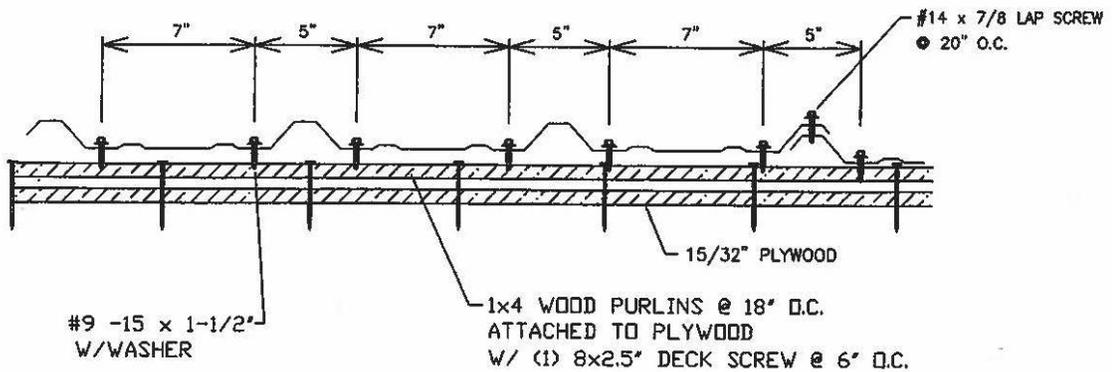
PBR Panel Detail (7-5-7-5-7 Fastener Pattern)
